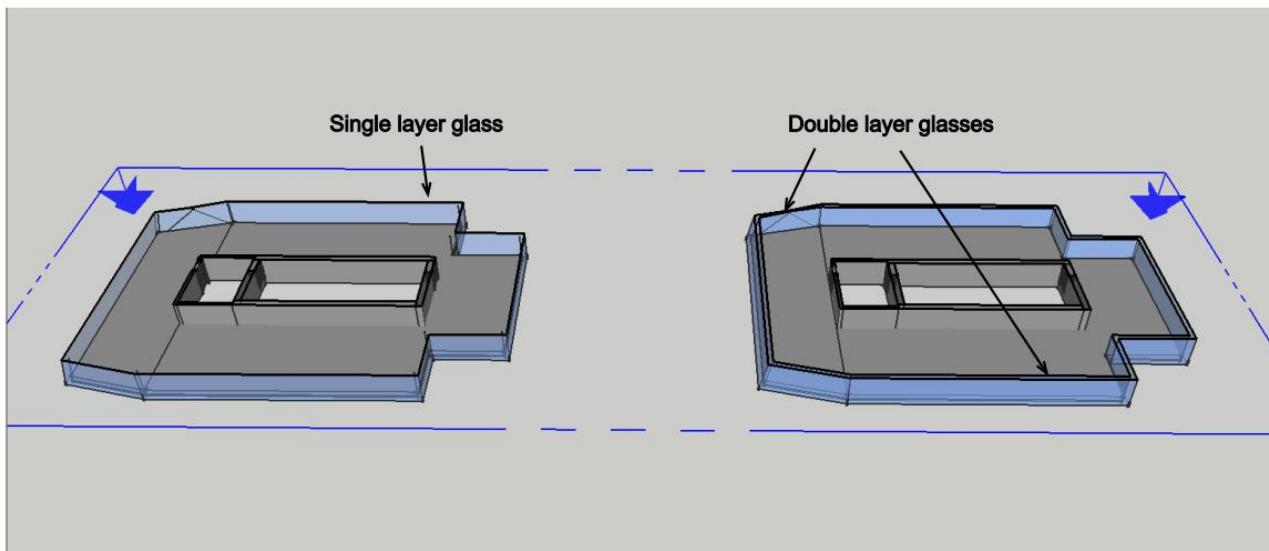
Single- and double-layers glasses (cladding) models in SU
